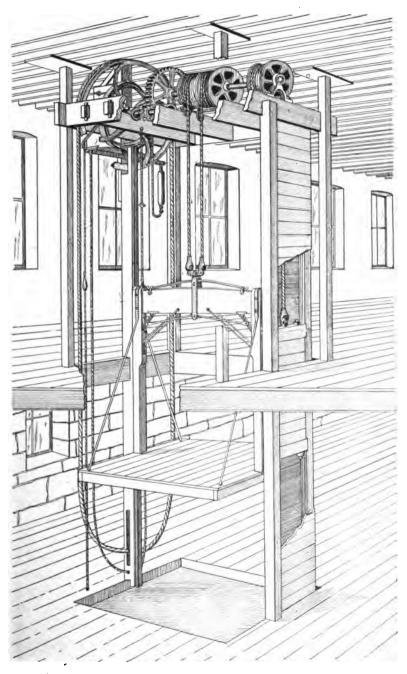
Detail Views of Center-Lift Elevator with Grooved Drums and Wire Ropes
